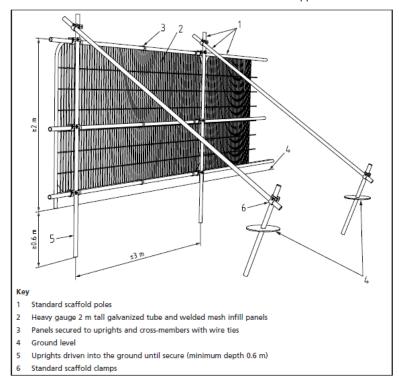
Tree Protection Barrier Specification (Source: Figure 2 from BS5837 - Default specification for protective barrier)
